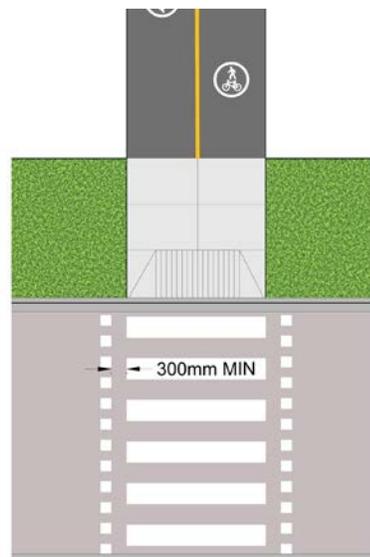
// COMBINED CROSSING PAVEMENT MARKINGS
